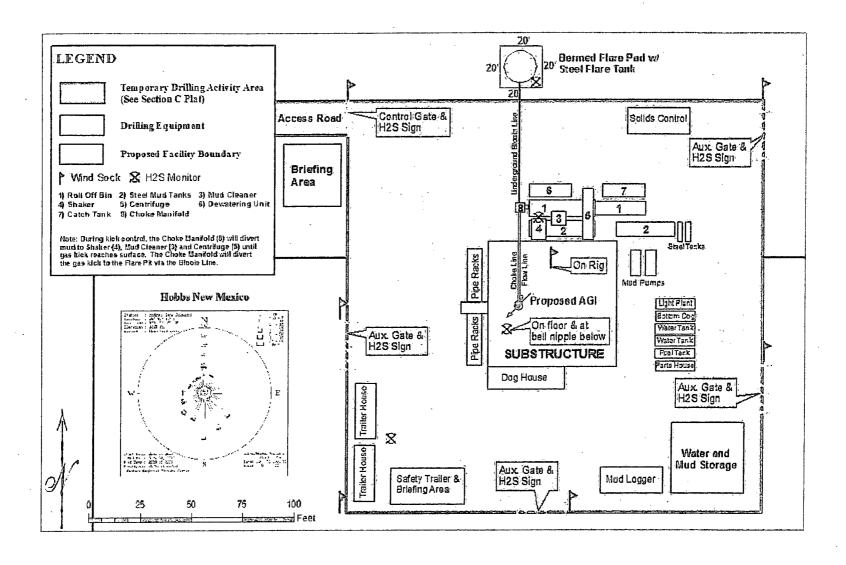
Site Plat Showing H2S Safety Features and Closed Loop System
